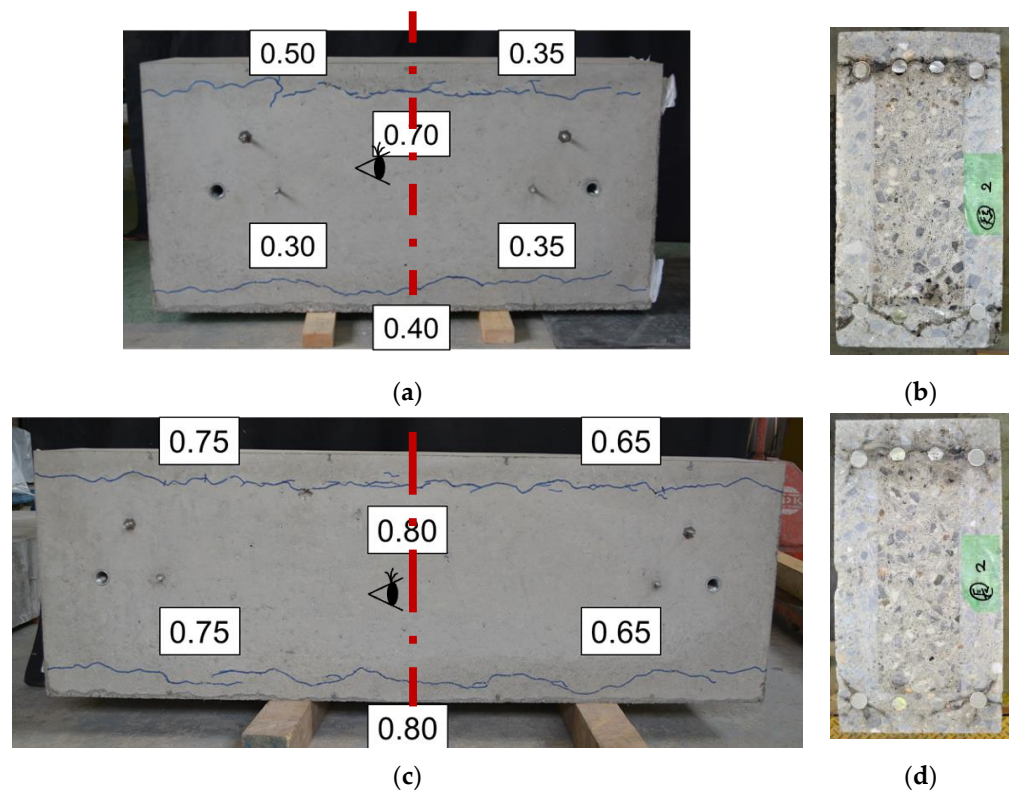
Crack simulated on beam with EAFP: (a) longitudinal surface crack in short specimen; (b) Internal crack in short specimen; (c) longitudinal surface crack in long specimen; (d) internal crack in long specimen.
